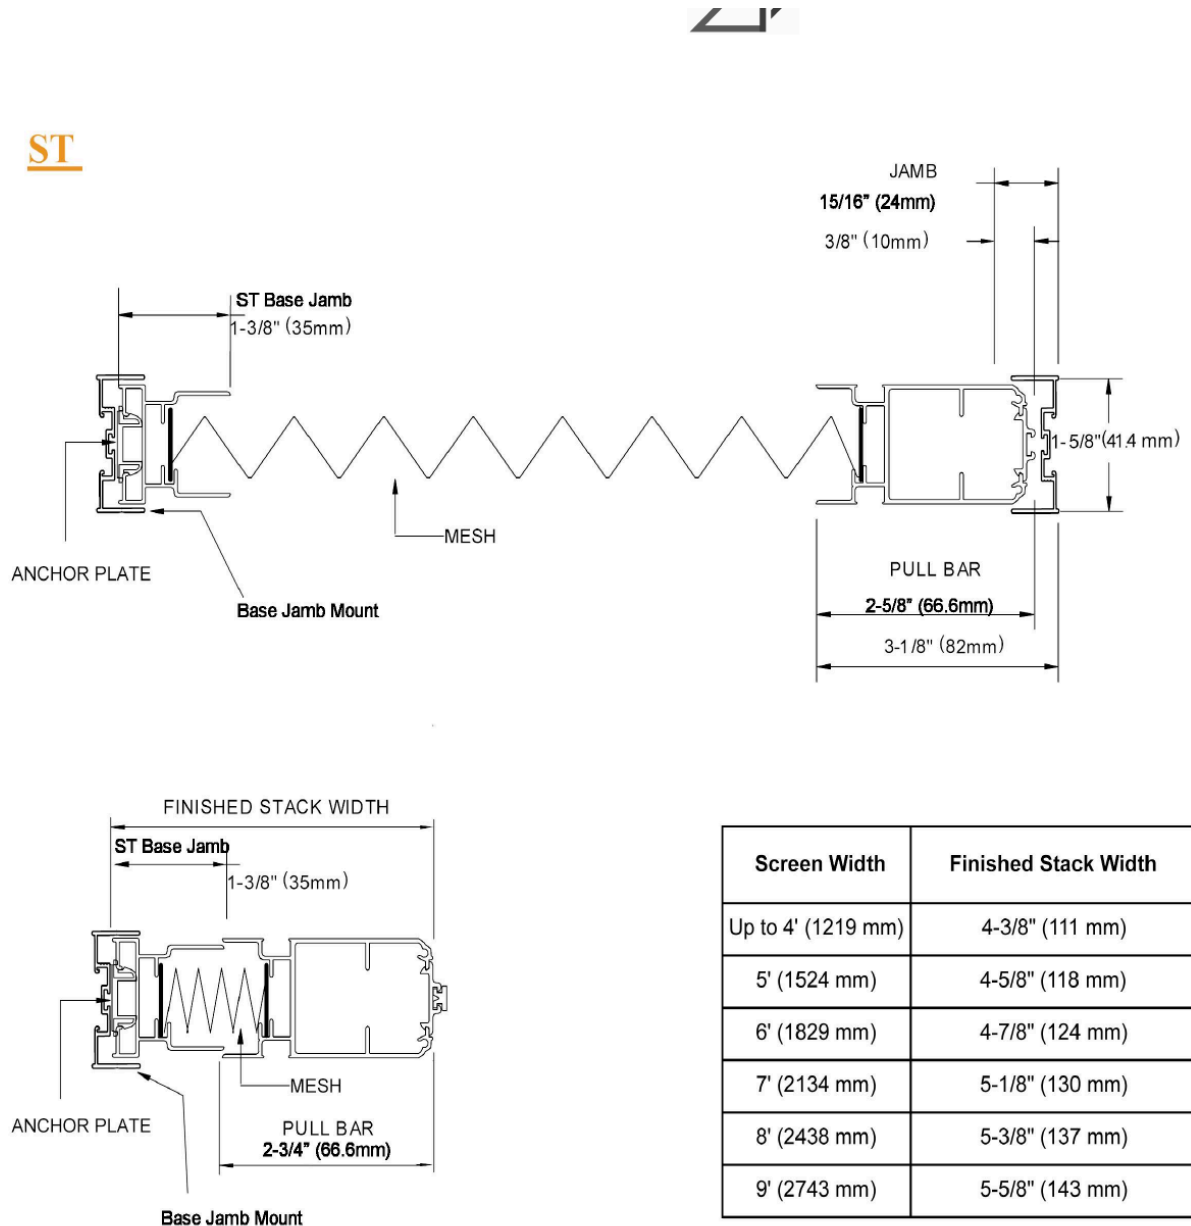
ST CARTRIDGE — INSIDE MOUNT, EXPLODED
